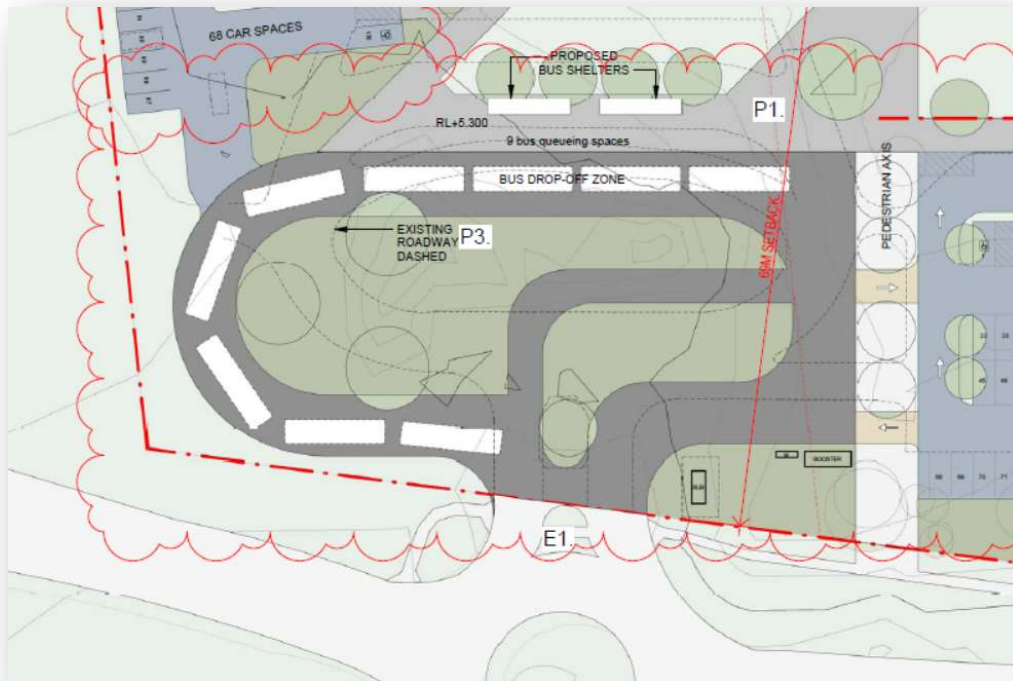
Extract from Front of Campus Site Plan (Drawing DA-11-21). The revised Bus Drop-off Area (P3) is shown to the left of the image (Source: Cox Architecture 2023)
